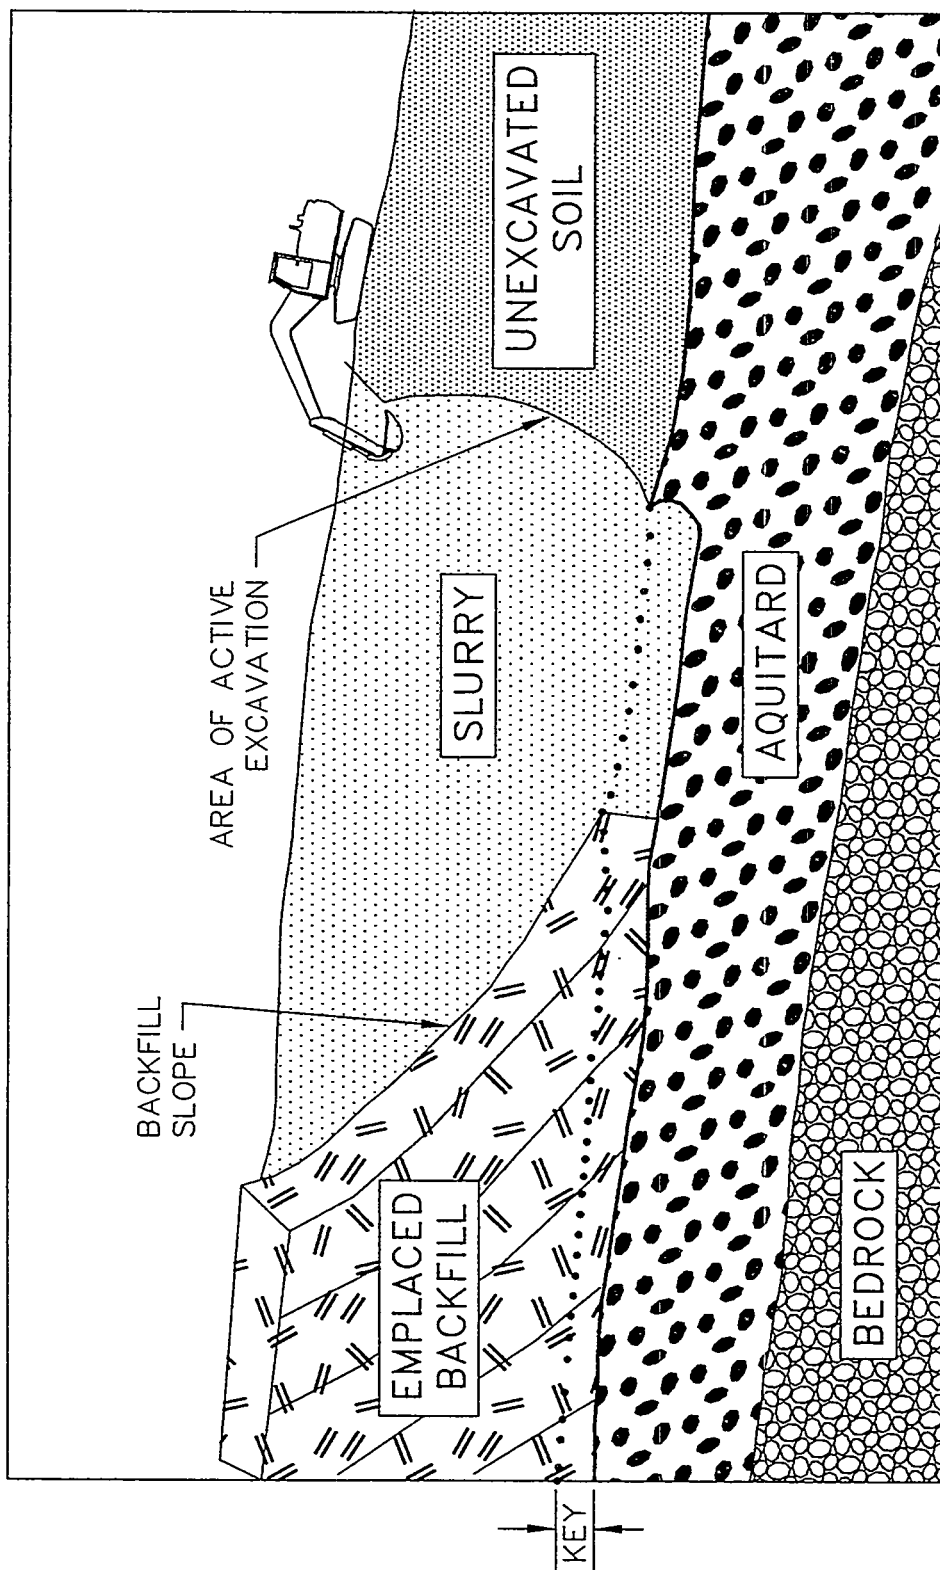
SOIL-BENTONITE SLURRY TRENCH CROSS-SECTION
